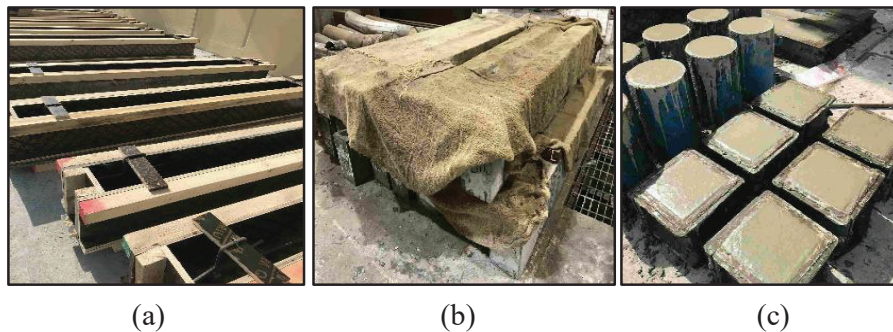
(a) Concrete formworks (b) Concrete curing process (c): Specimens casting process.
